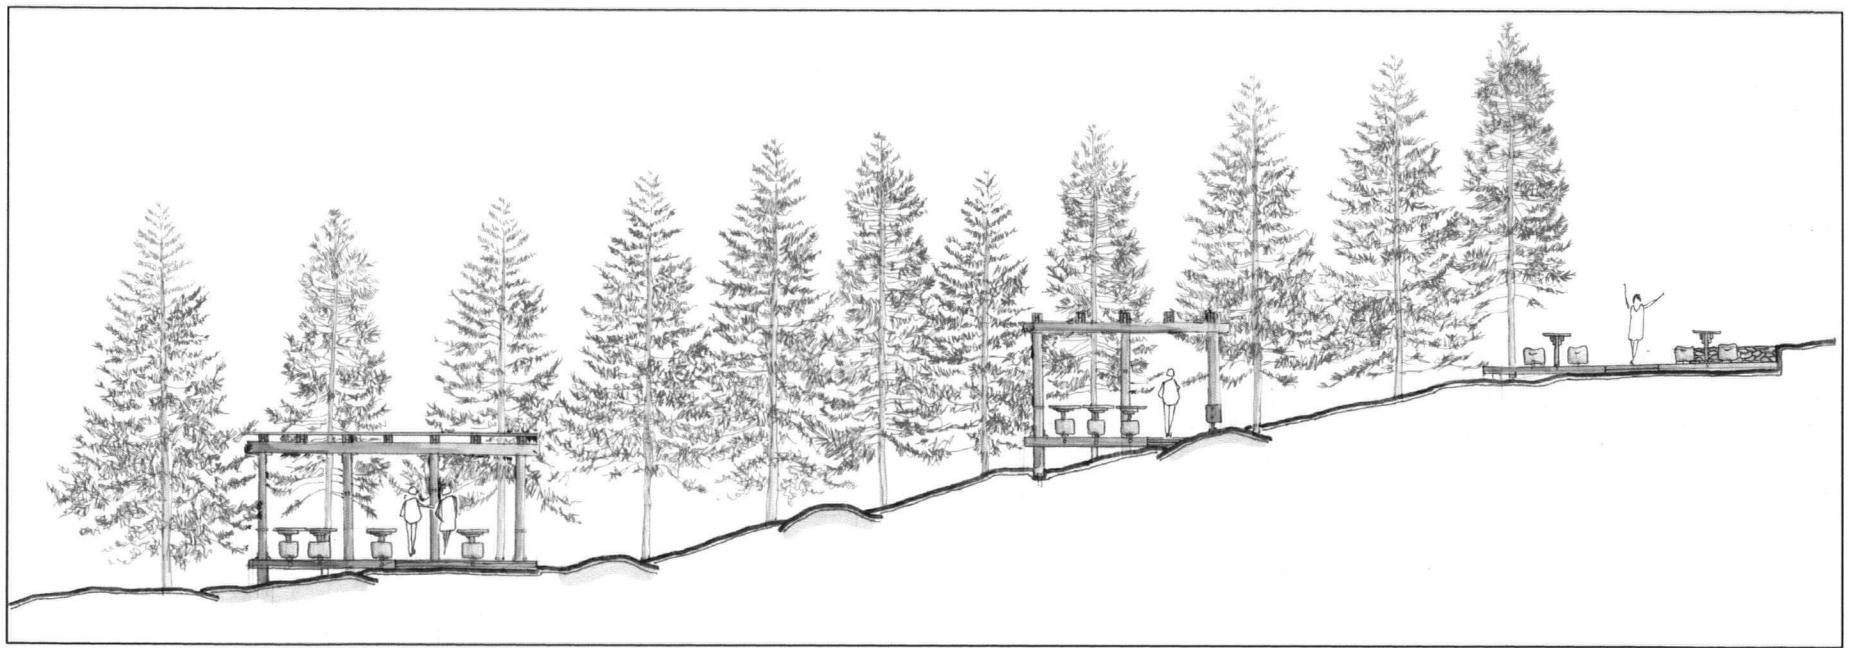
Elevation drawing of the Lone Tree Picnic Area. Small shelters nestled against the woods.
